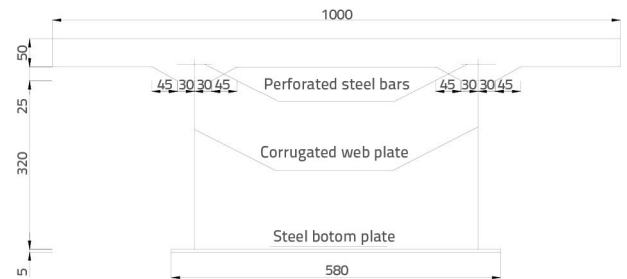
Cross-sectional dimensions for the geometric model (unit: mm)
